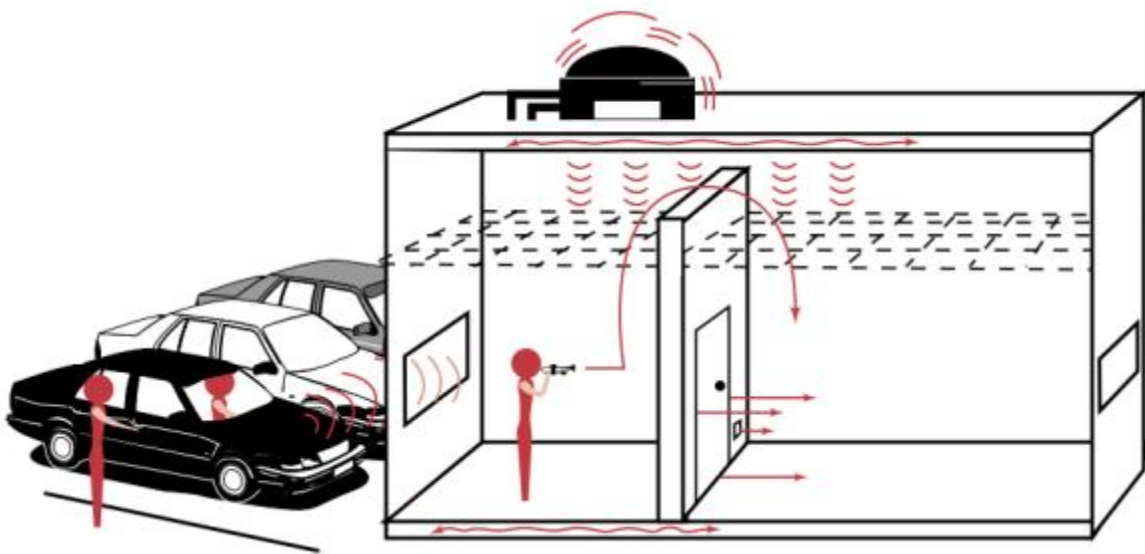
Uncontrolled travel/leakage of sound through a building
